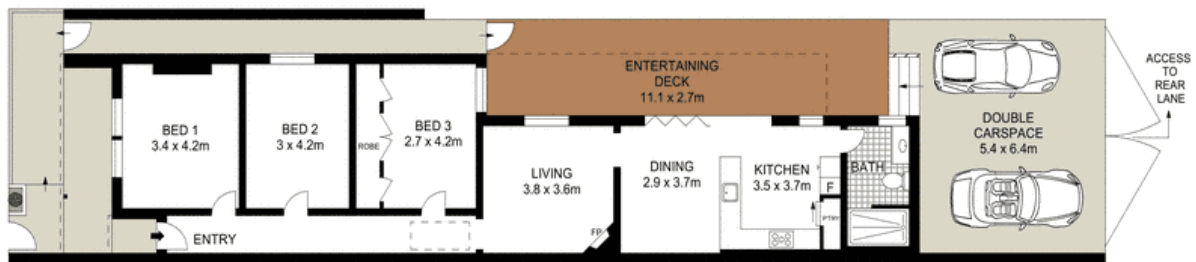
Floor plan (Source: <https://www.realestate.com.au/property/29-bydown-st-neutral-bay-nsw-2089/>)
